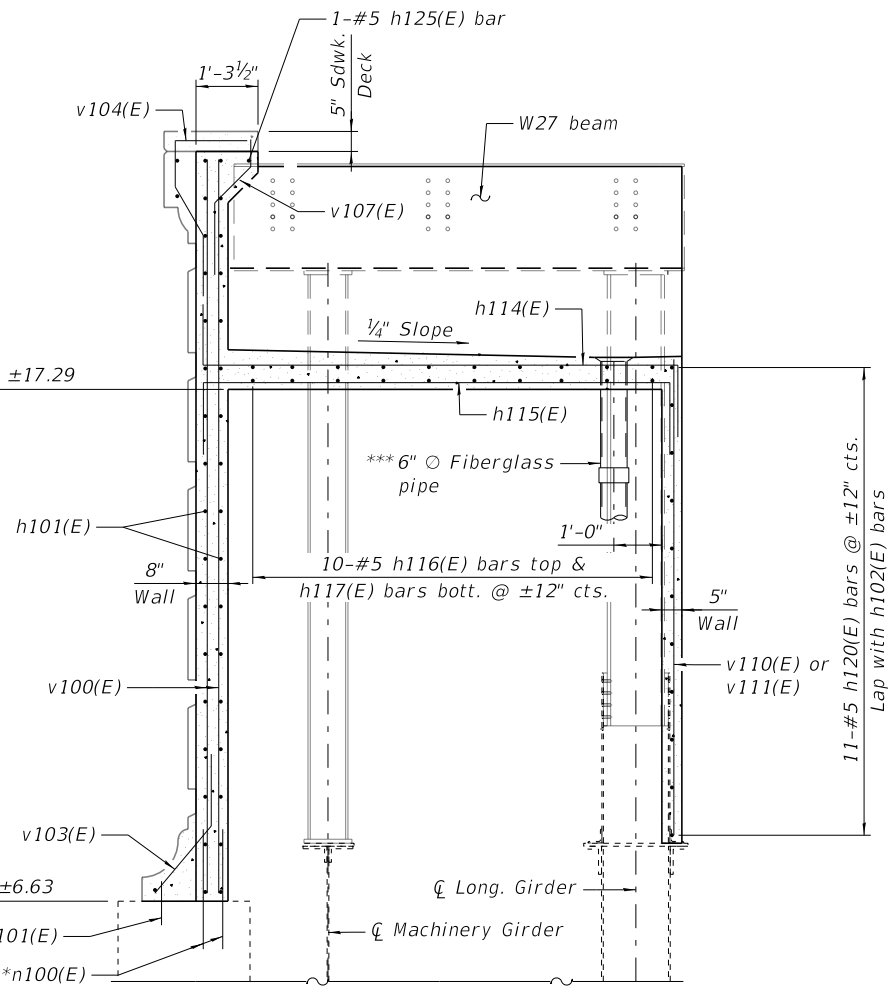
BOTTOM - SW ENCLOSURE WALL
